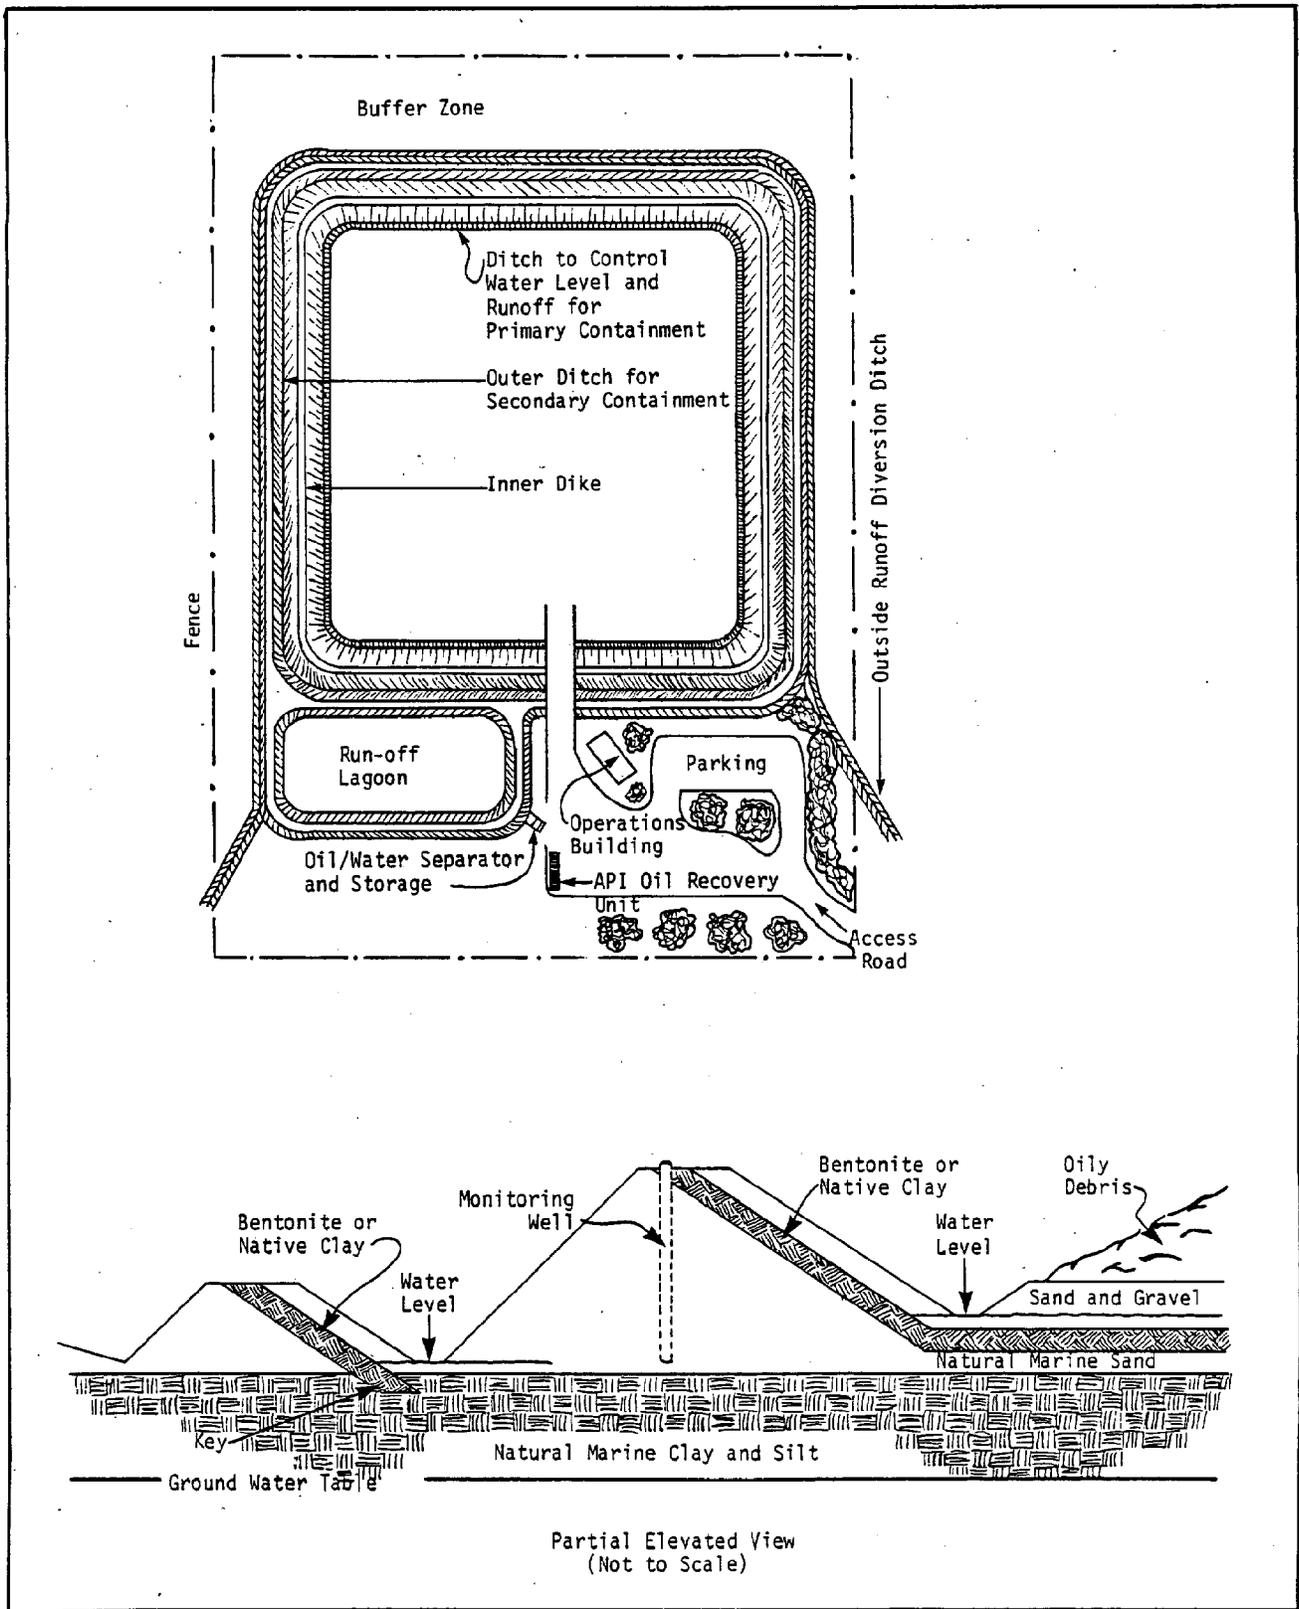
Fully developed clay-lined storage/stockpiling site (Source: SCS Engineers, 1979).
